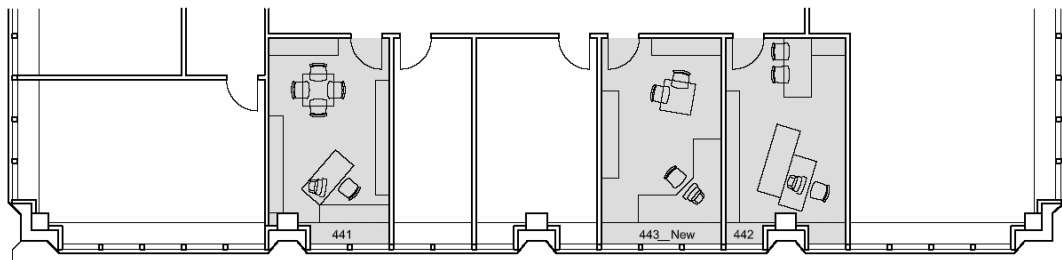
Schematic plan of the monitored rooms in the 4th floor
